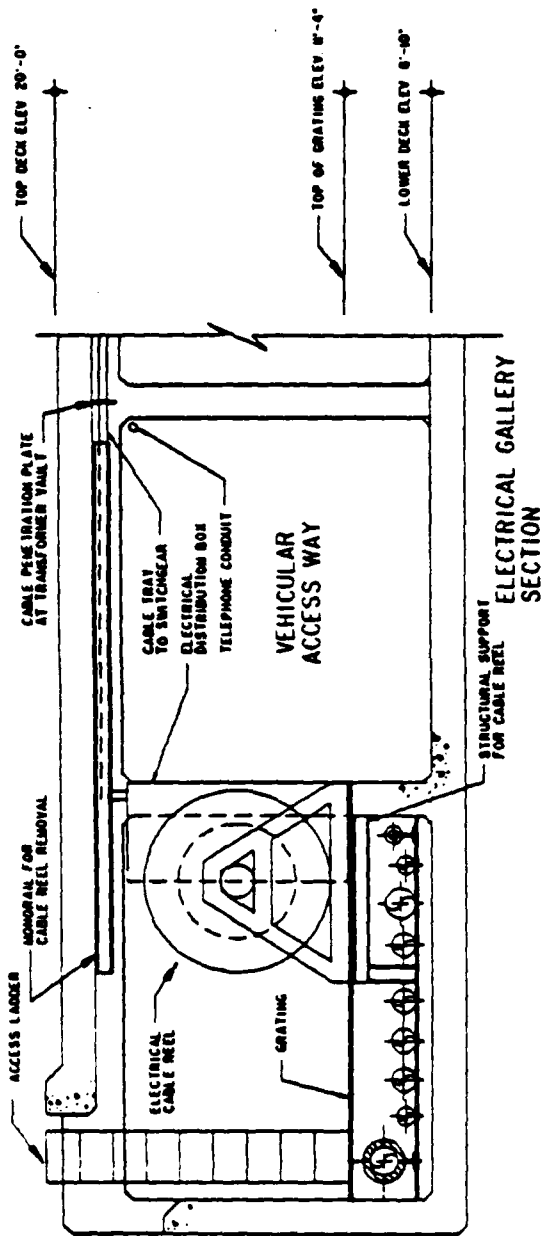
Alternate Utility Gallery, Pile-Supported Pier
